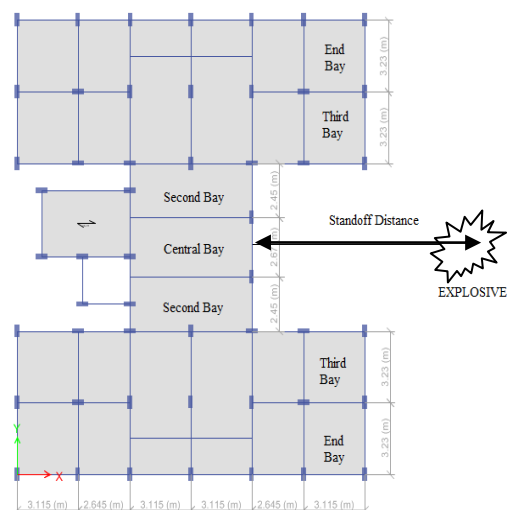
Typical location of explosive along Face 3(F3) & typical layout of Irregular Building
